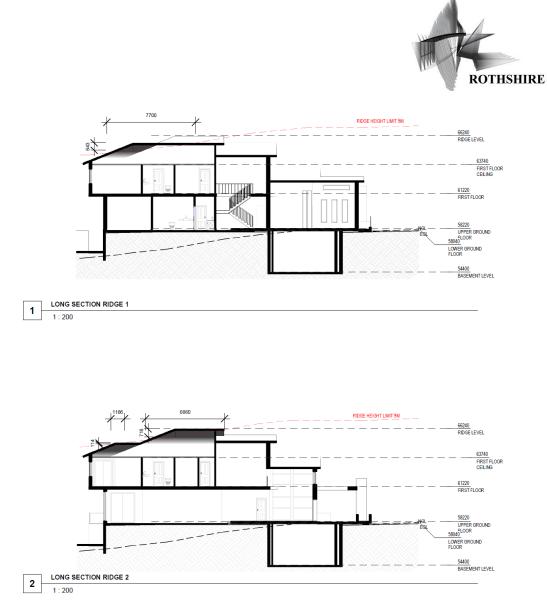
Extract of proposed section (Drawing No. DA-802) showing extent of proposed variation.
